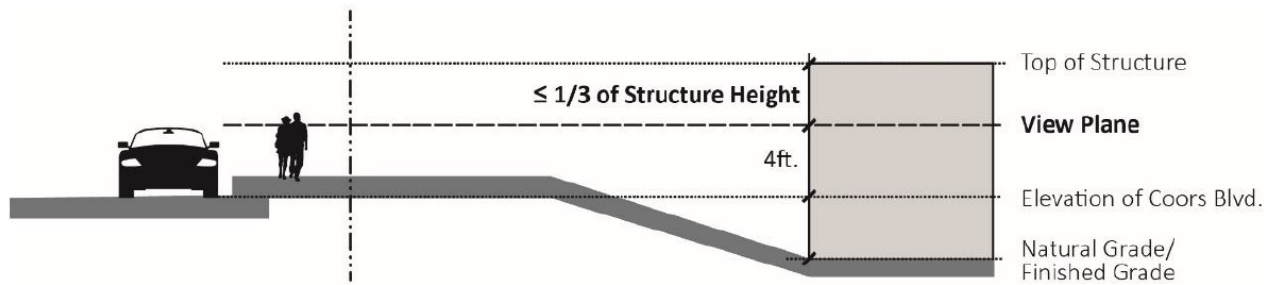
Replace elevation of Coors Blvd. with elevation of nearest public right of way, include all requirements called out in 6-6(M)(2)(e)2
